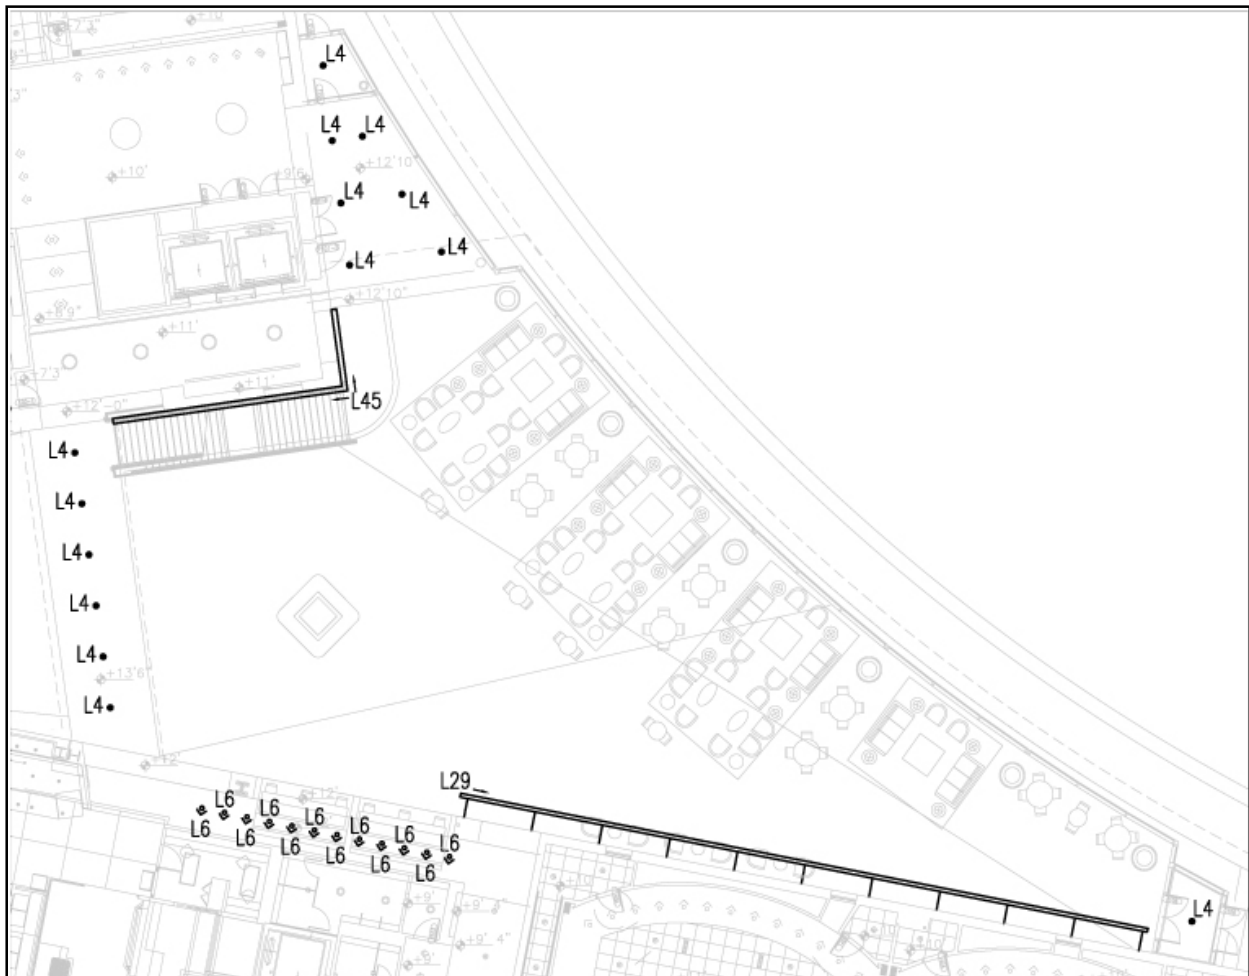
Atrium Lighting Plan And Furniture Layout, First Floor
